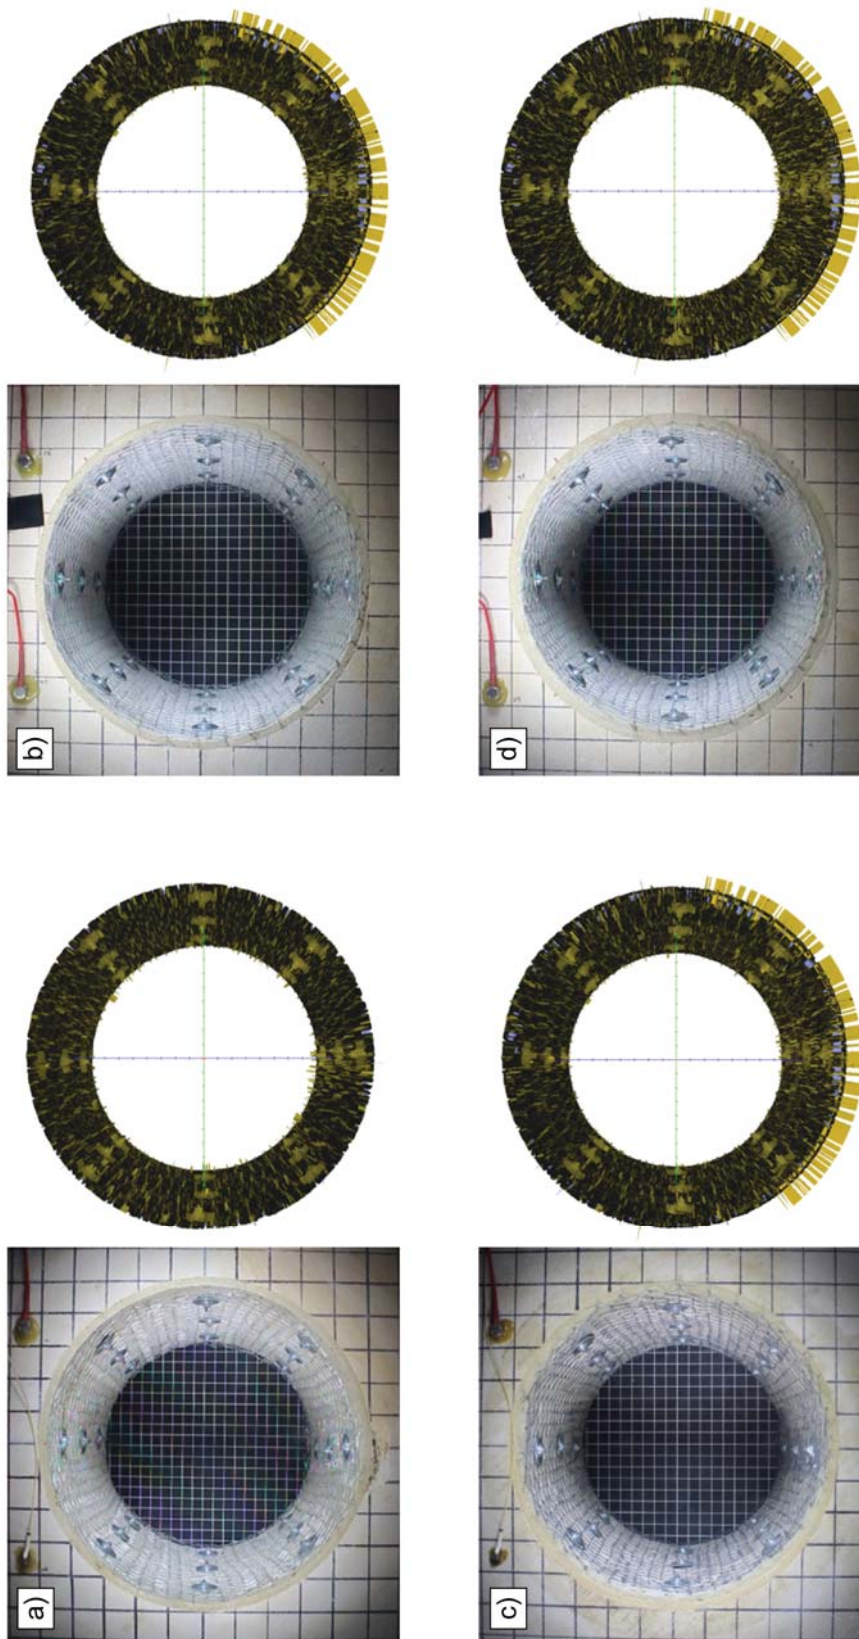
Excavation surface and 3D views by laser scanning before testing a) Specimen No.11 b) Specimen No.12 c) Specimen No. 14 d) Specimen No.15.
